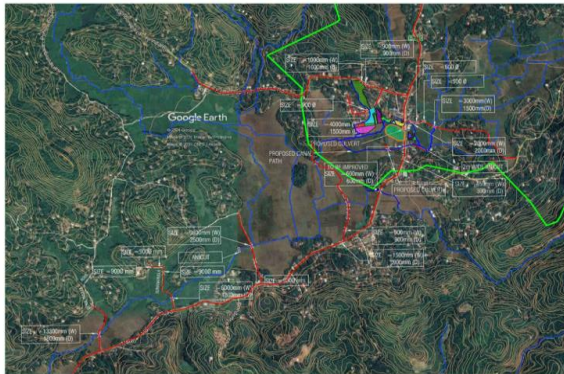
Proposed Conceptual Drainage Plan with UDA first Proposal
